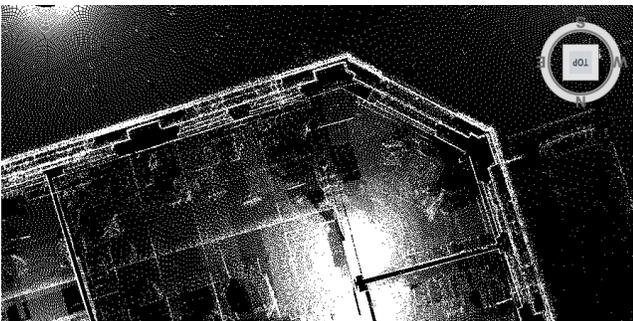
Plan of building envelope in Autodesk Navisworks after combining interior and exterior scans.
